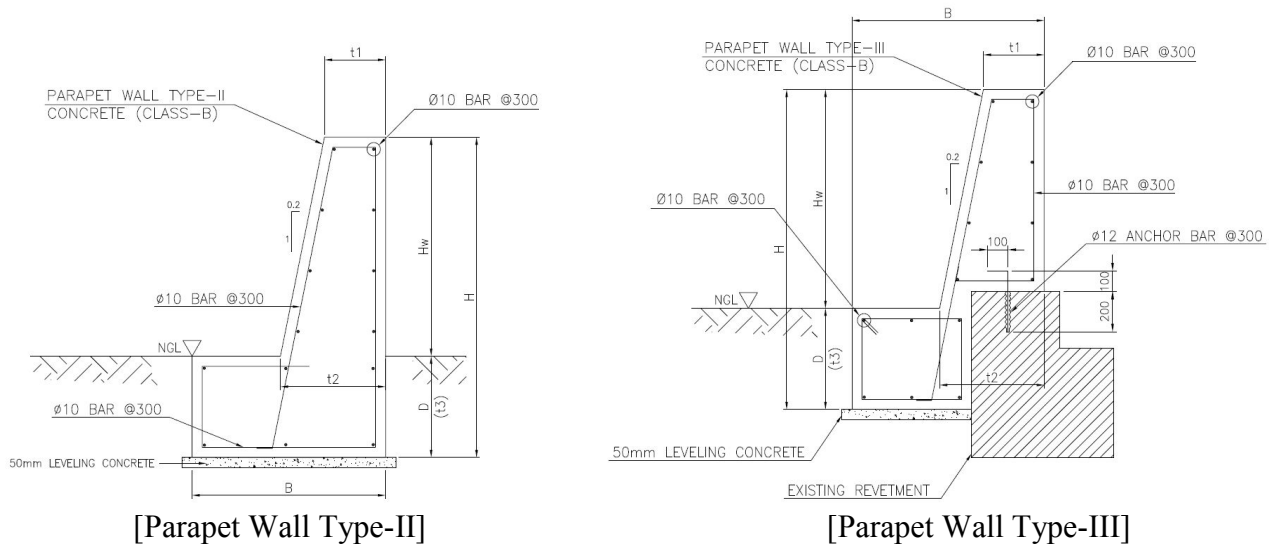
Typical Cross Section of Parapet Wall Type-II, III
